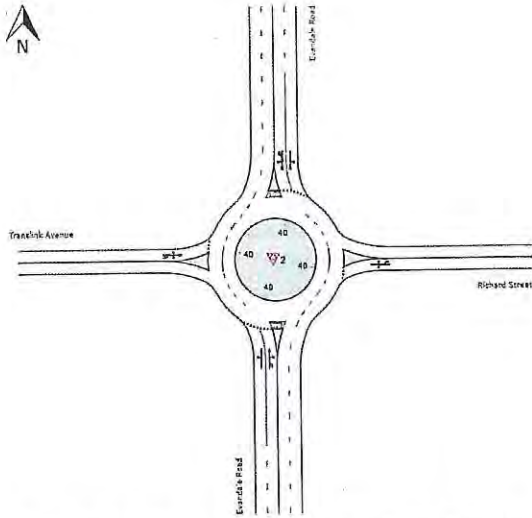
Translink Avenue/ Richard Street/ Evandale Main Road Proposed Roundabout SIDRA Modelling Layout
